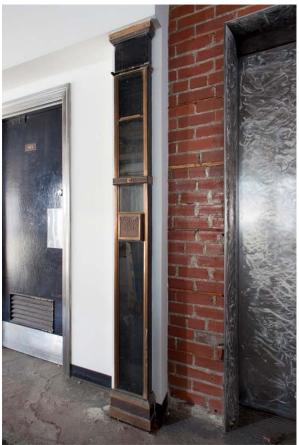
View of washroom door, mail chute, & elevator door typical for 4th to 10th floors
